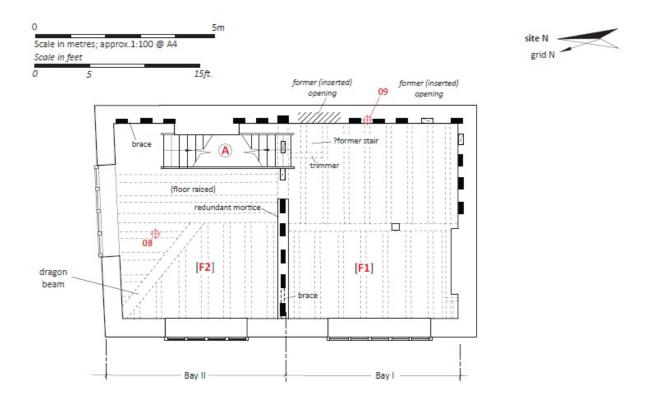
First-floor plan showing the location of two samples taken for dendrochronology [adapted from an original drawing by Ric Tyler]
